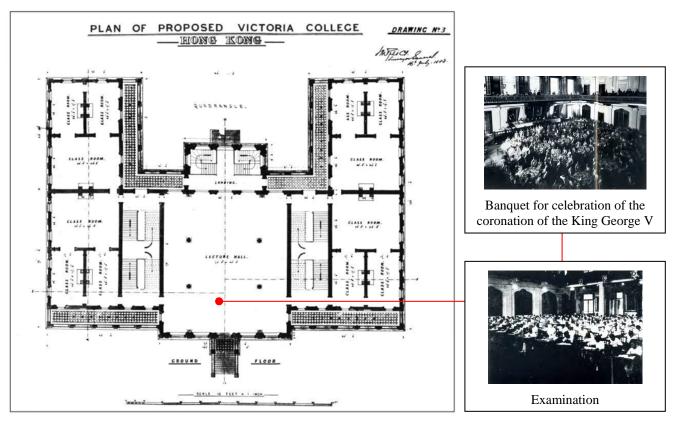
Ground floor plan of Victoria College (renamed as Queen's College in 1894) in 1889.
